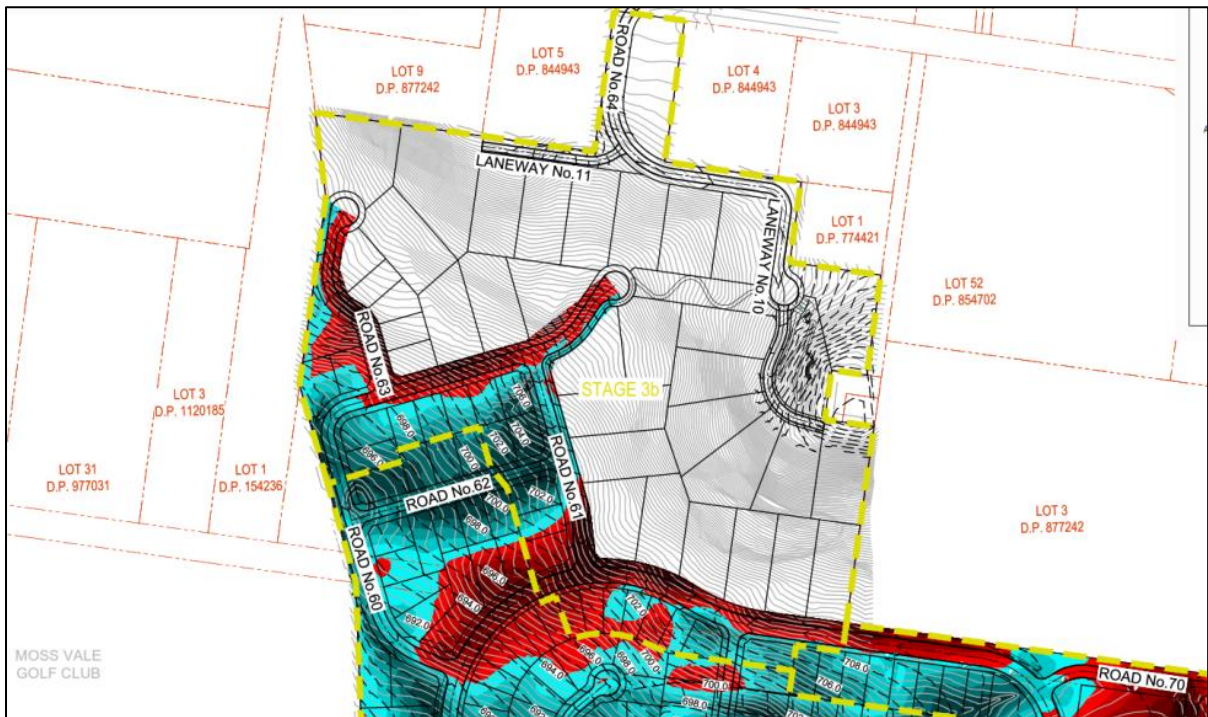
Excerpt of the bulk earthworks plan for the steep hillside.
